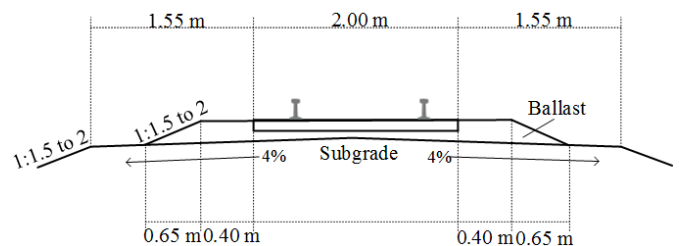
Typical railway section for Metre gauge of single track (SRT 1982).
